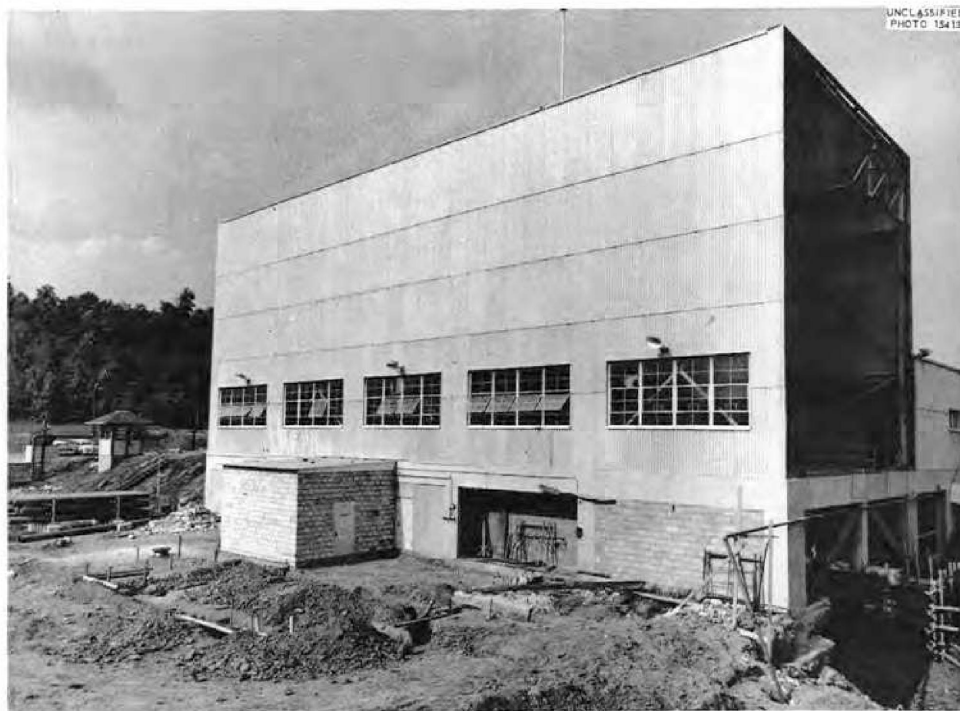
Status of Construction at ART Building in September 1955.
